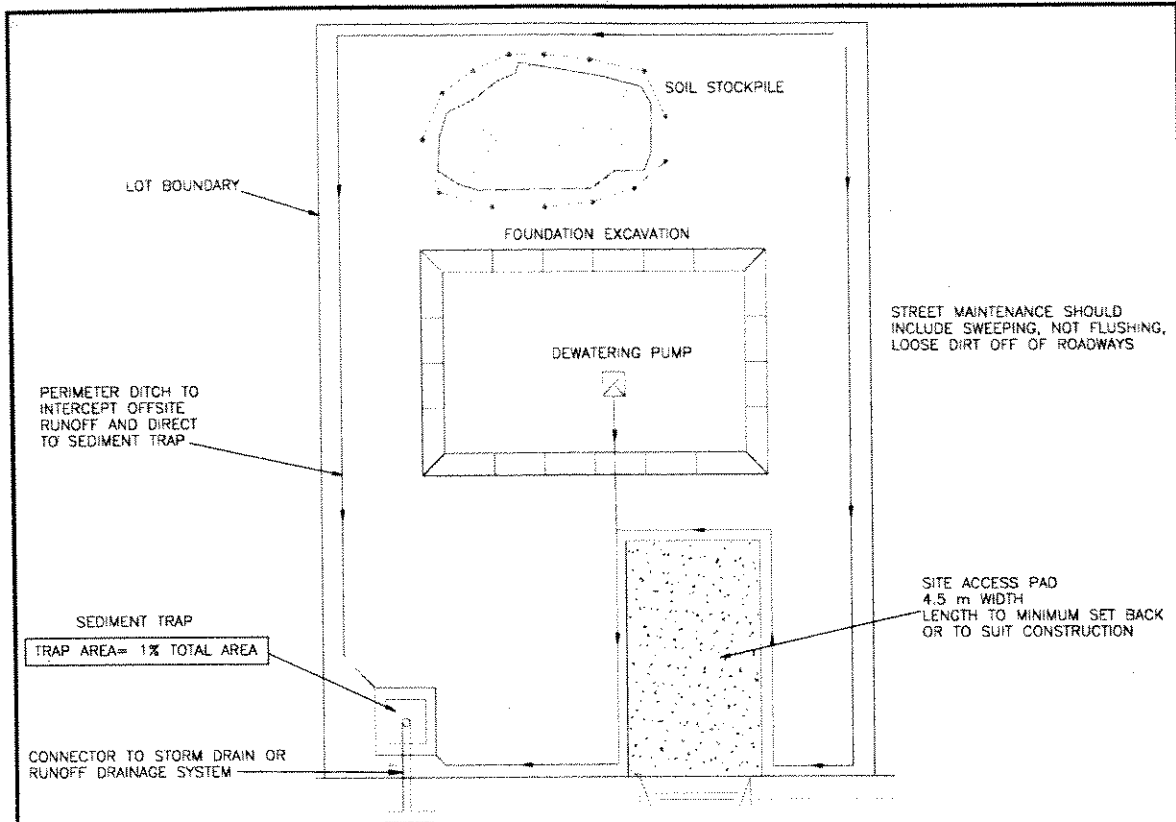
E06 illustrates a typical lot development plan with erosion and sediment control features.
